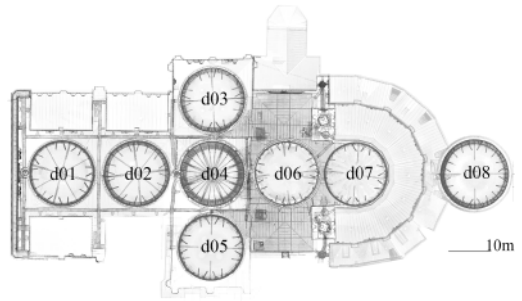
Plan of the domes: façade dome (d01), intermediate dome (d02), *arca* dome (d03), angel dome (d04), Chapel of St Jacob dome (d05), presbytery dome (d06), choir dome (d07), Chapel of the Relics dome (d08). D01, d02, d03 are supposed original. d04, d05, d06 and d07 suffered fire damage in 1749.
